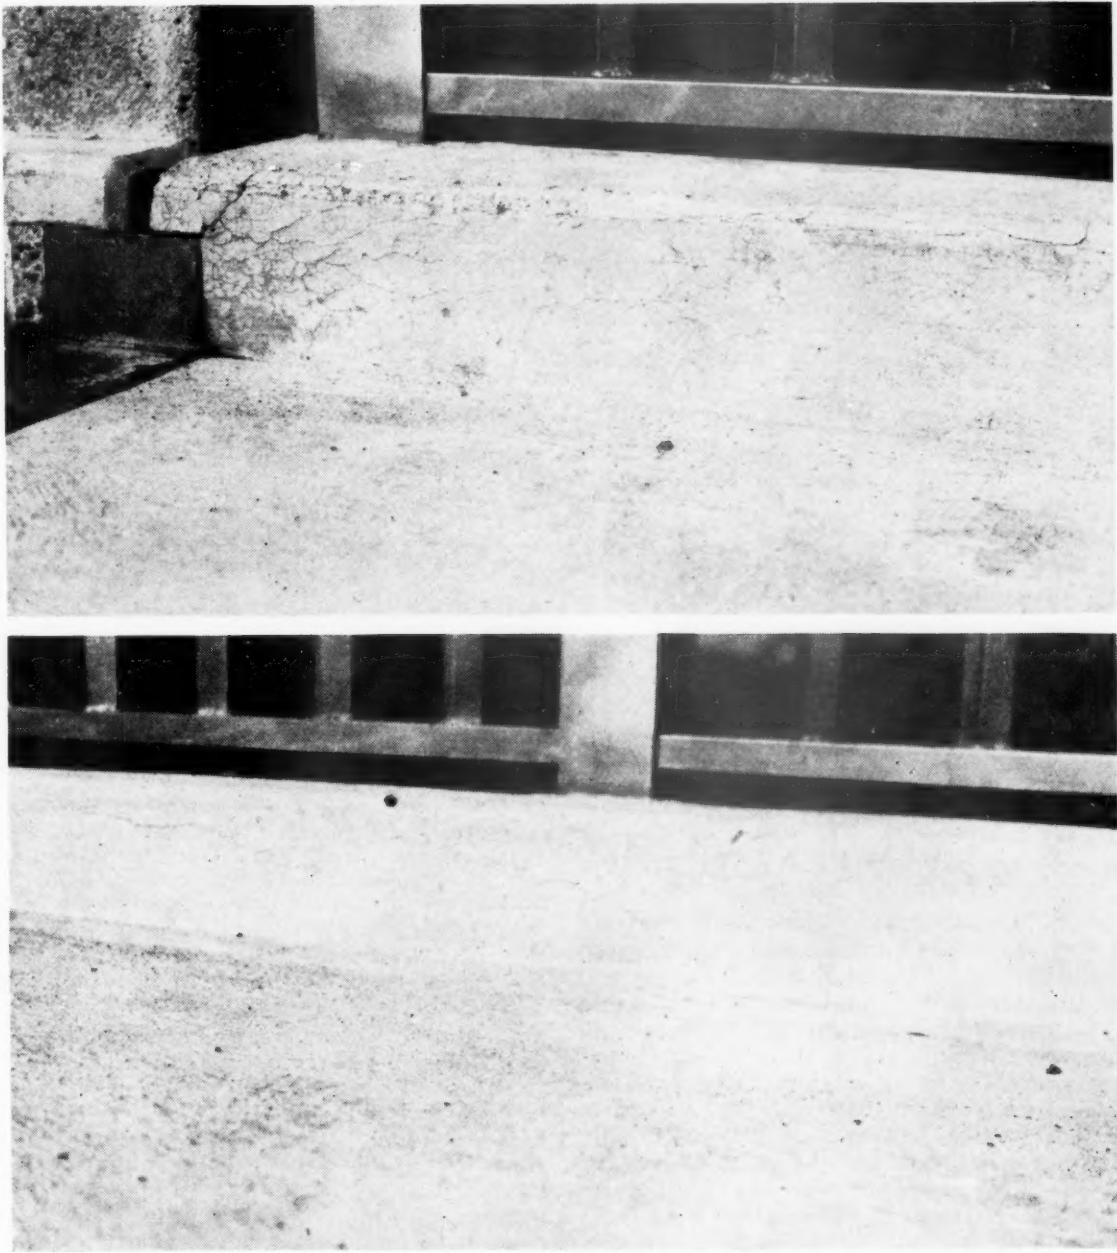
FIRST STAGE OF TYPE 2 DETERIORATION ON A BRIDGE IN YELLOWSTONE PARK. FINE CRACKS APPEAR AT JOINT AND ALONG CURB.
